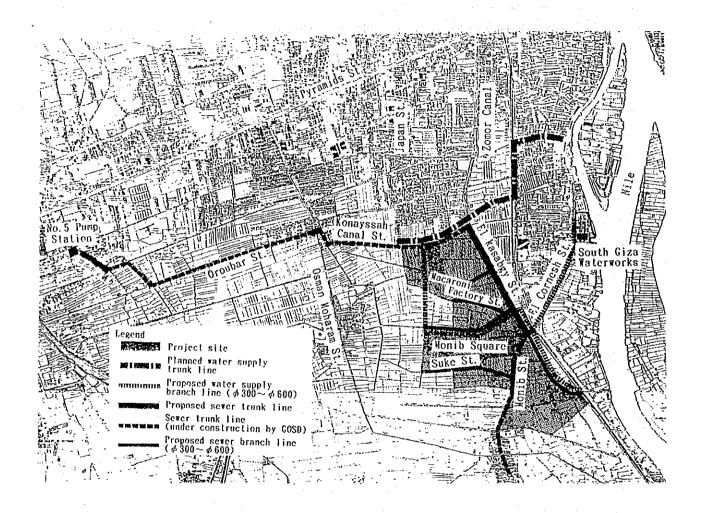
Plan of New Water Supply and Sewer Facilities
